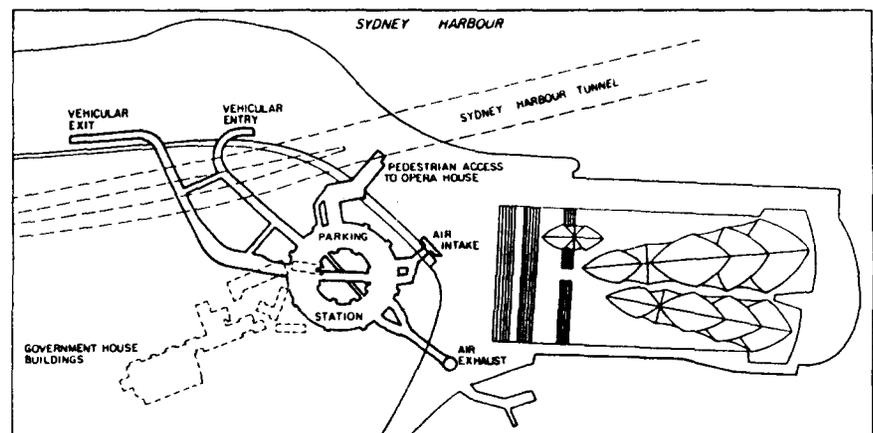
Location plan of the Sydney Opera House Underground Car Park (Source: Pells 1993).
